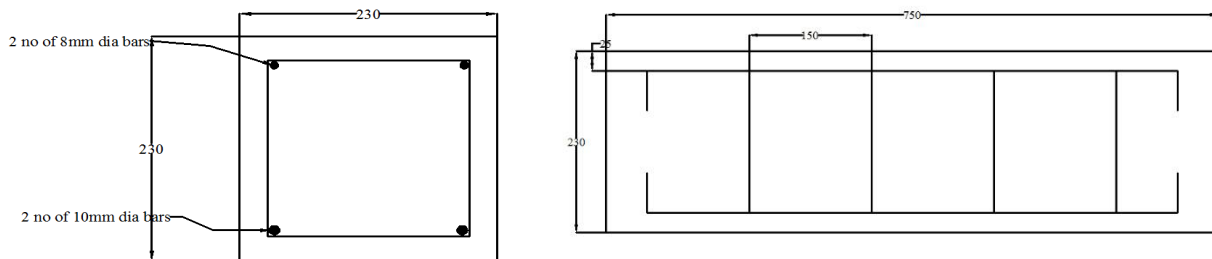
REINFORCEMENT DETAILS OF THE BEAM
